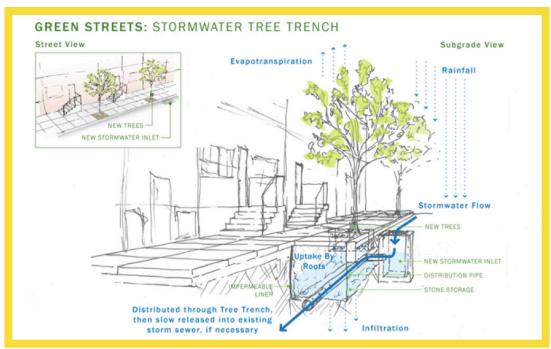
Rendering of a stormwater tree trench Source: *Philadelphia Water Department
